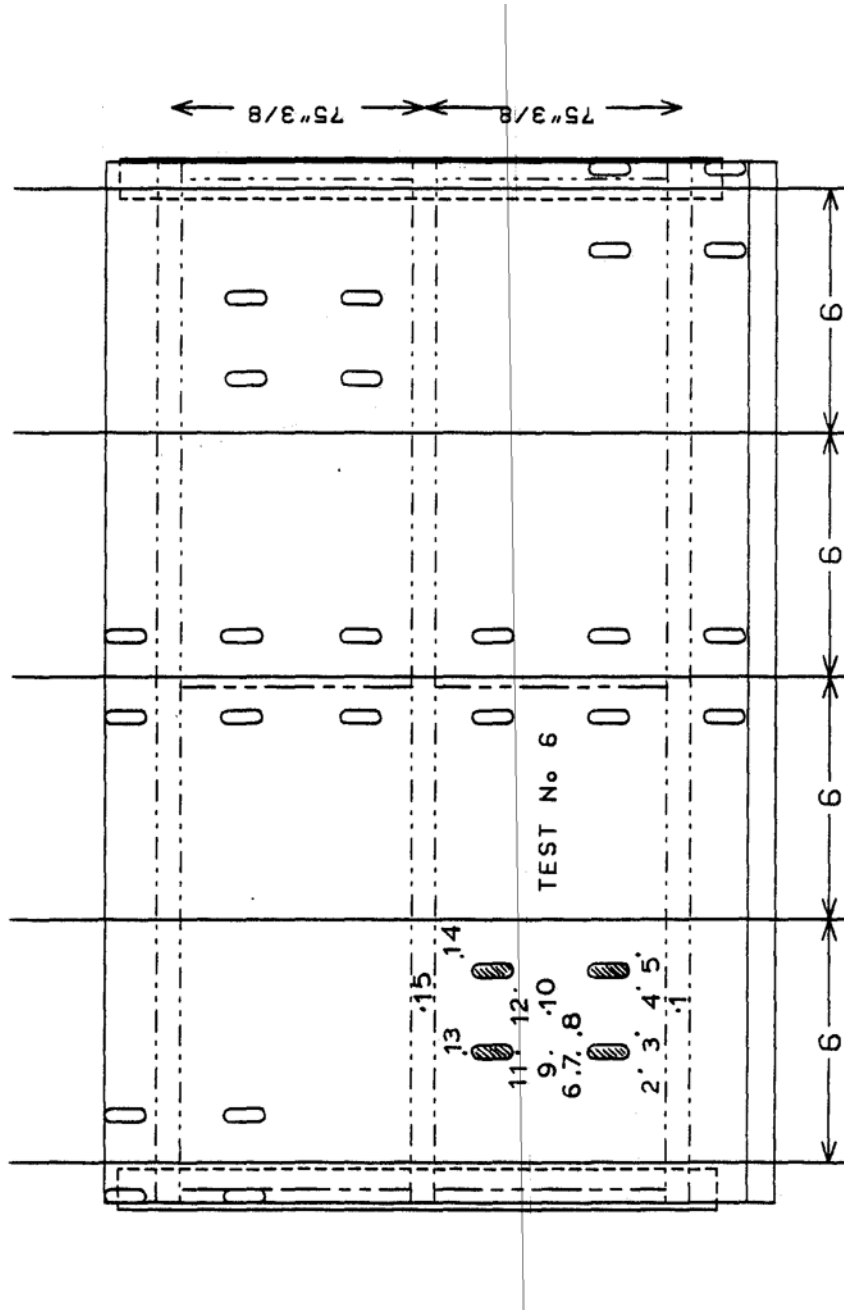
LVDT Locations (Second Bridge - Test No. 6)
